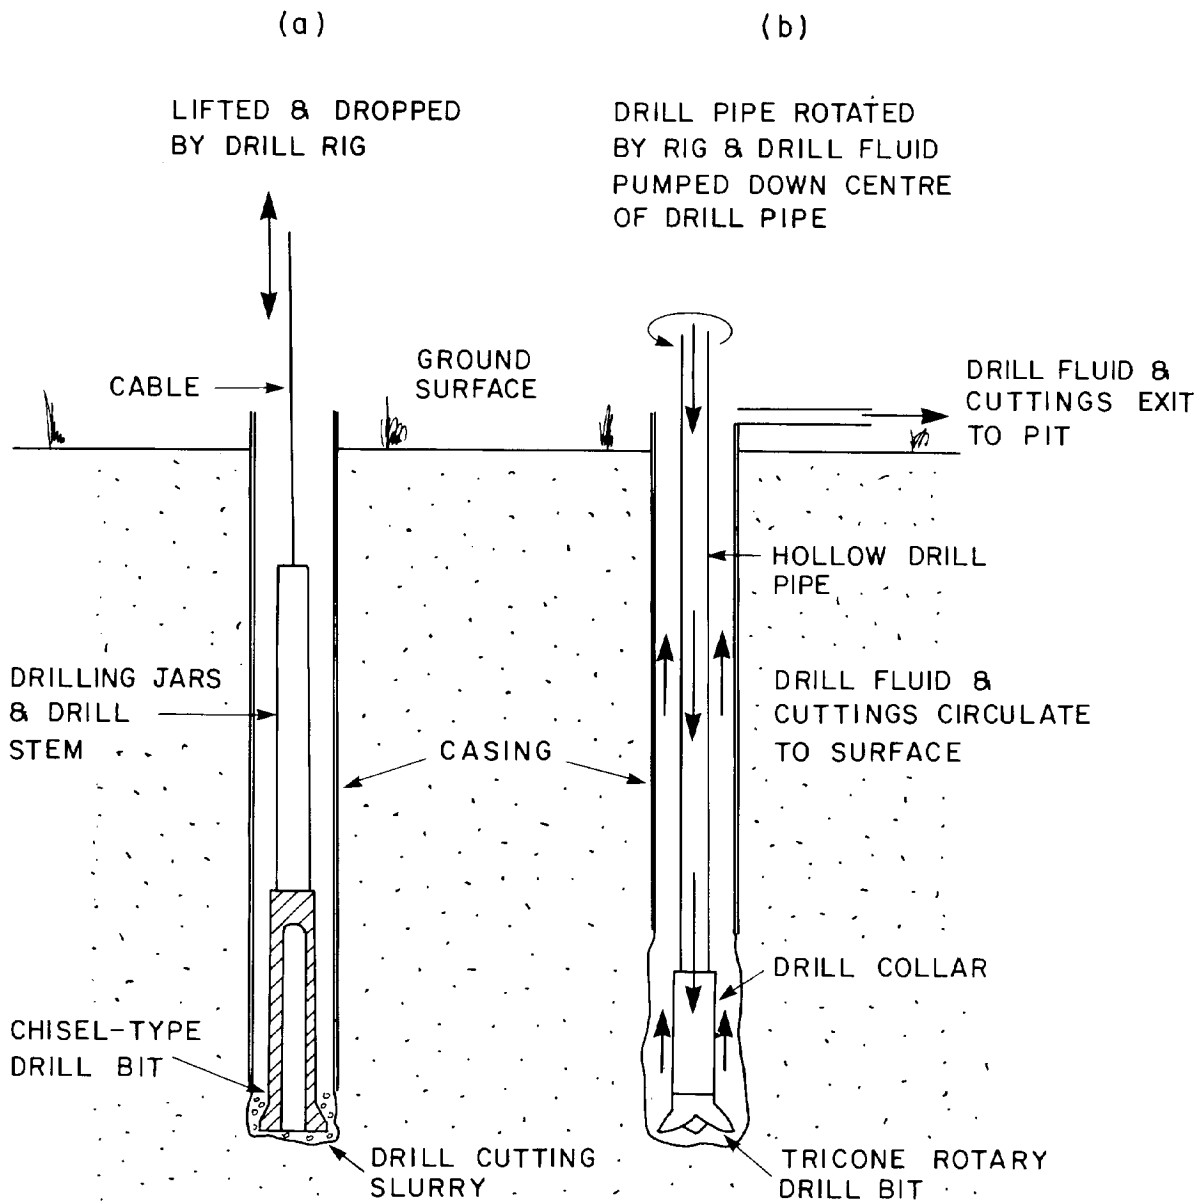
Schematic of: (a) Cable Tool Drilling; and (b) Direct Mud Rotary Drilling
